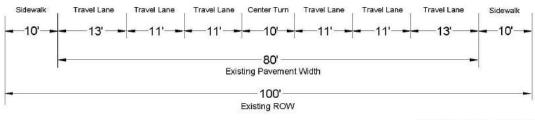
Alternative D: Century Boulevard Alignment Century Boulevard, Looking West at Station
